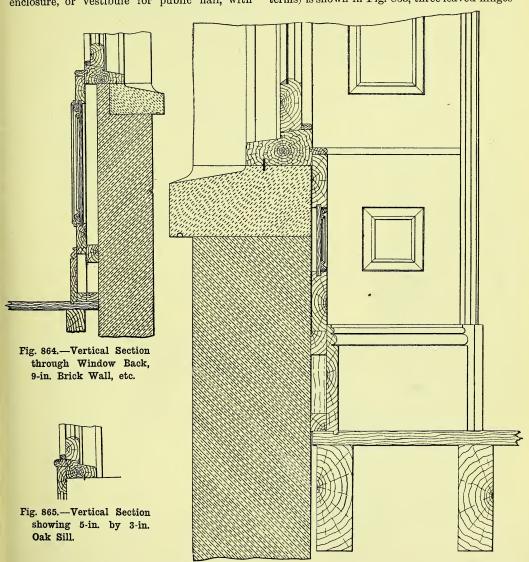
Window in Cross Section, showing Bottom Rail of Sash, Wood Sill of Frame, Stone Sill, and Window Back.
